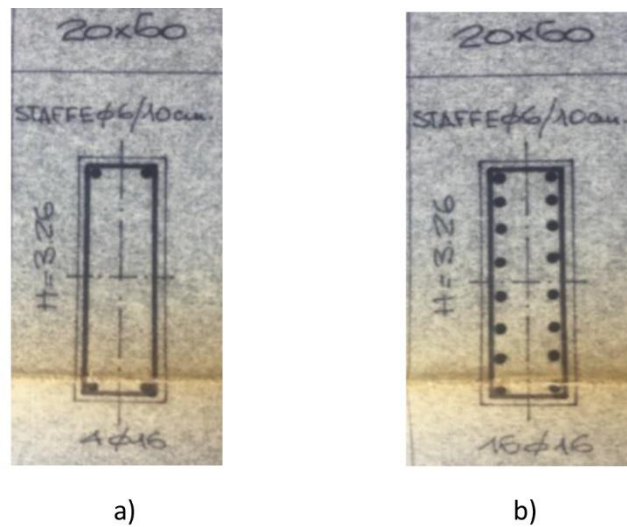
Position of the reinforcements in the central (a) and external (b) columns.
